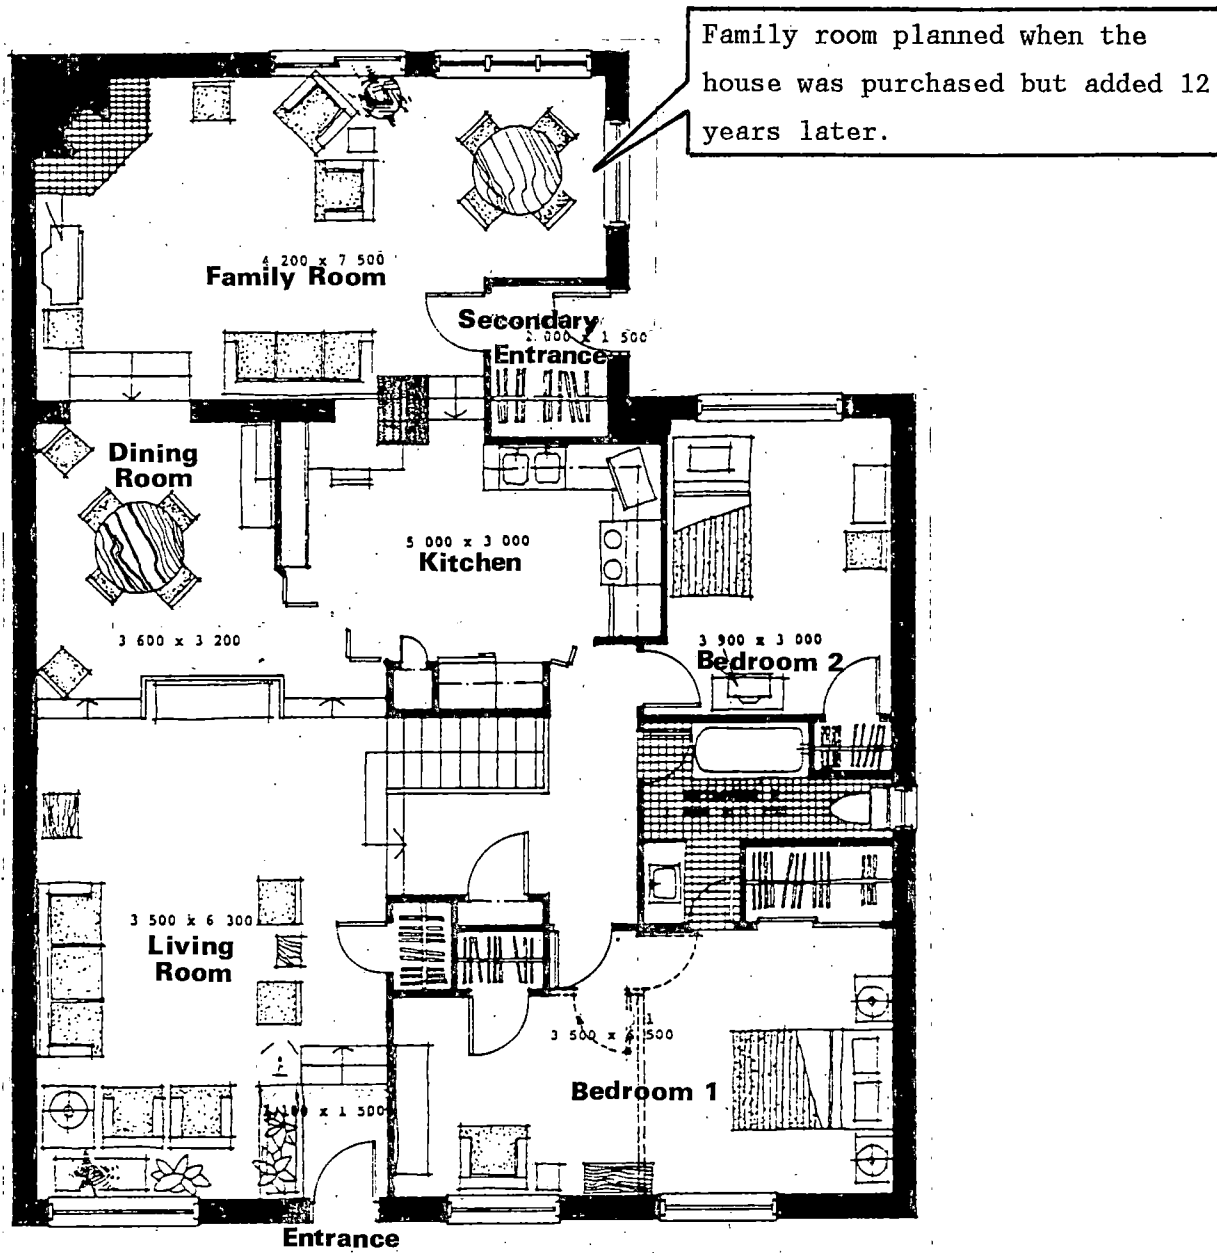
Ground floor plan of "split-level", Household 09 (0971).
